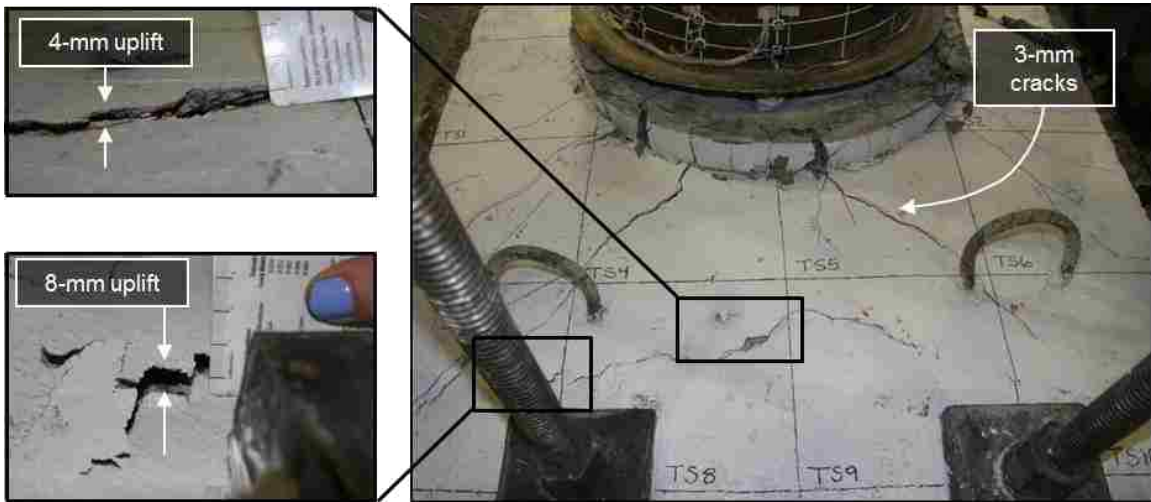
WRCUB (a) Soffit-flange opening at first bar fracture, and (b) South concrete uplift at 10.53% drift North
